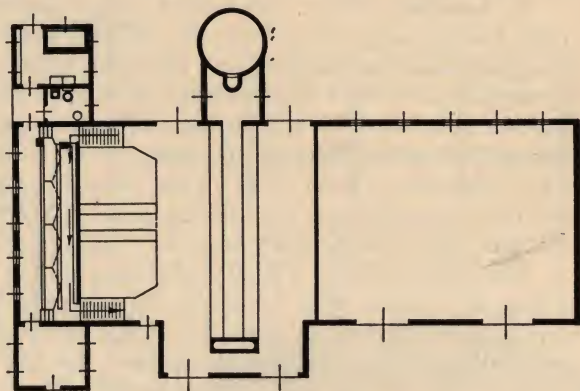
A typical 2 story barn remodeling plan for loose housing.
